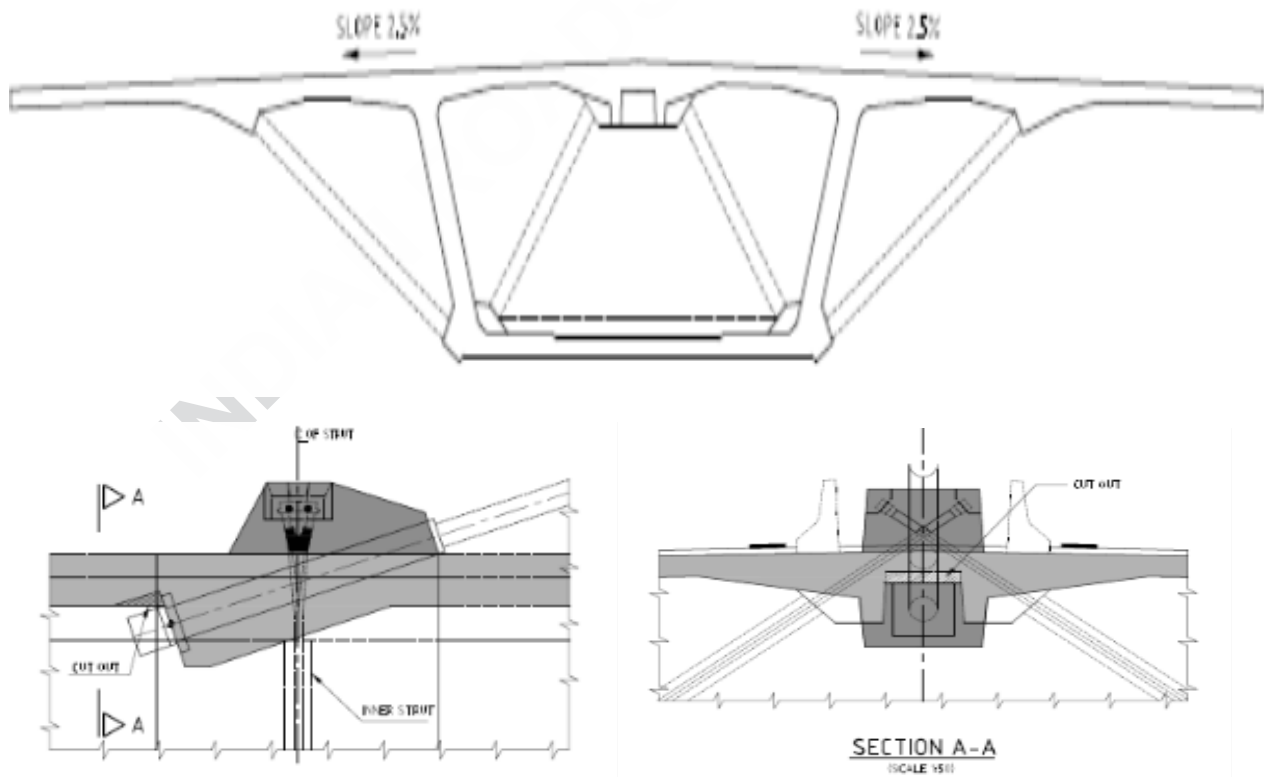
Typical Connection between central cable and wide mono cell deck
